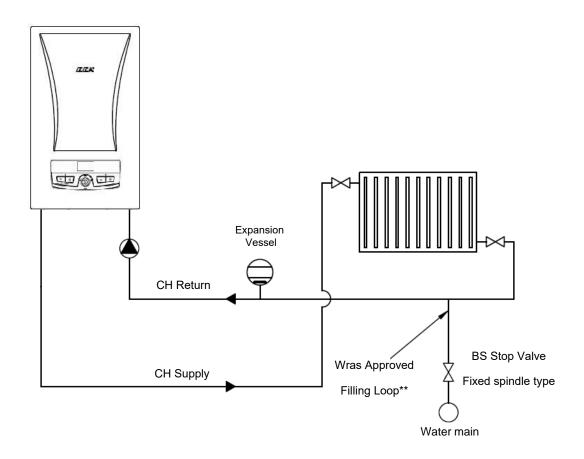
Installation for CH Boiler (Heat Only Type Installation)
